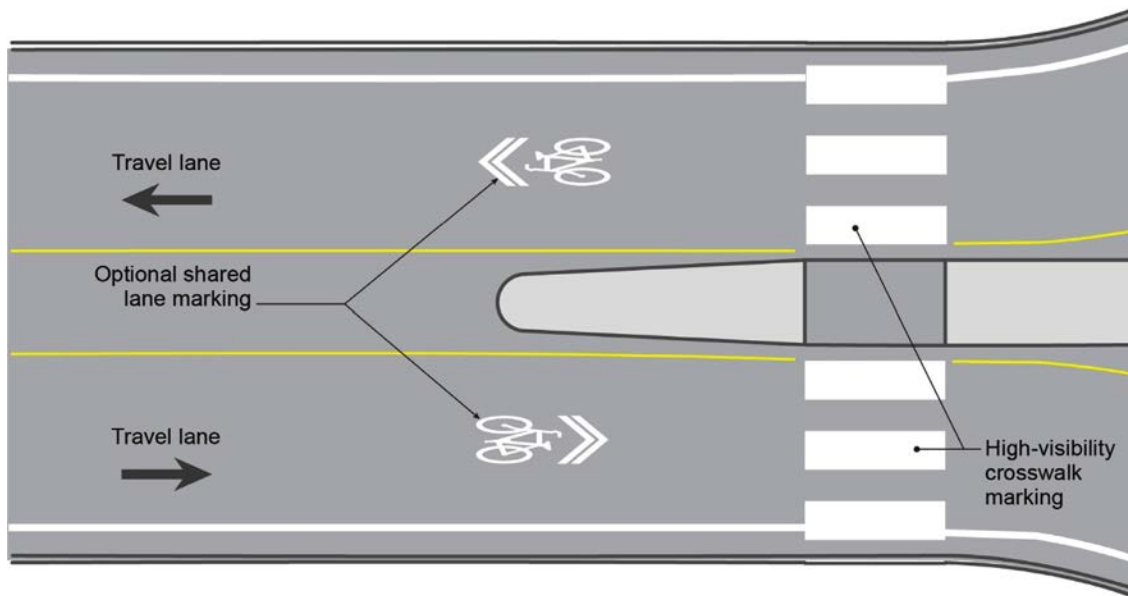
illustrates typical crosswalk markings for crosswalks at roadway level for a single-lane entry and exit. Where a raised crossing is used, the raised crossing should also be marked as illustrated in Exhibit 12.15.
